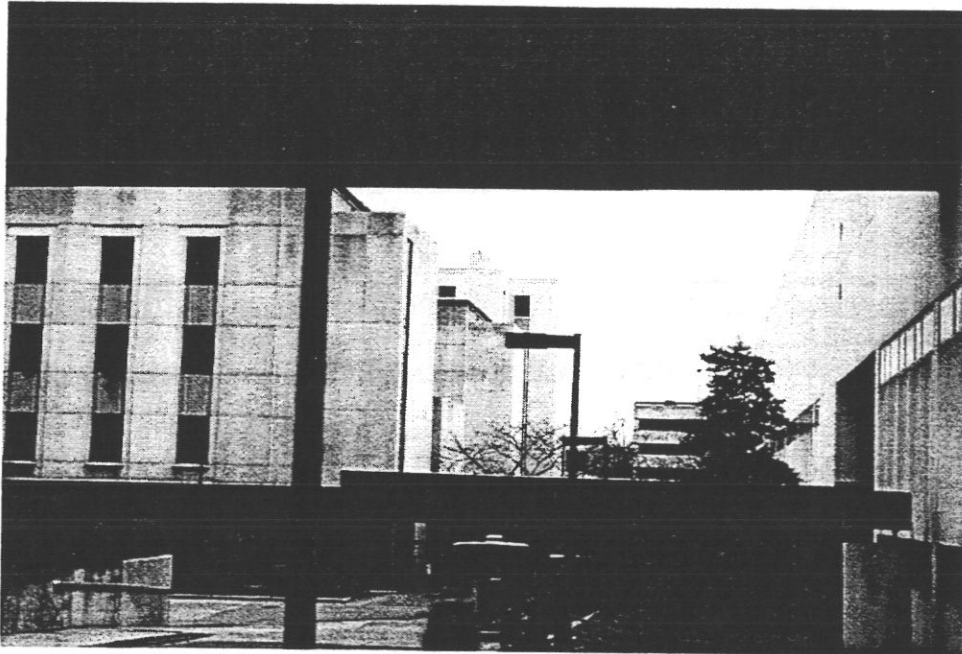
Remaining sections of Buildings 4 and 6. Building 4 in foreground.
